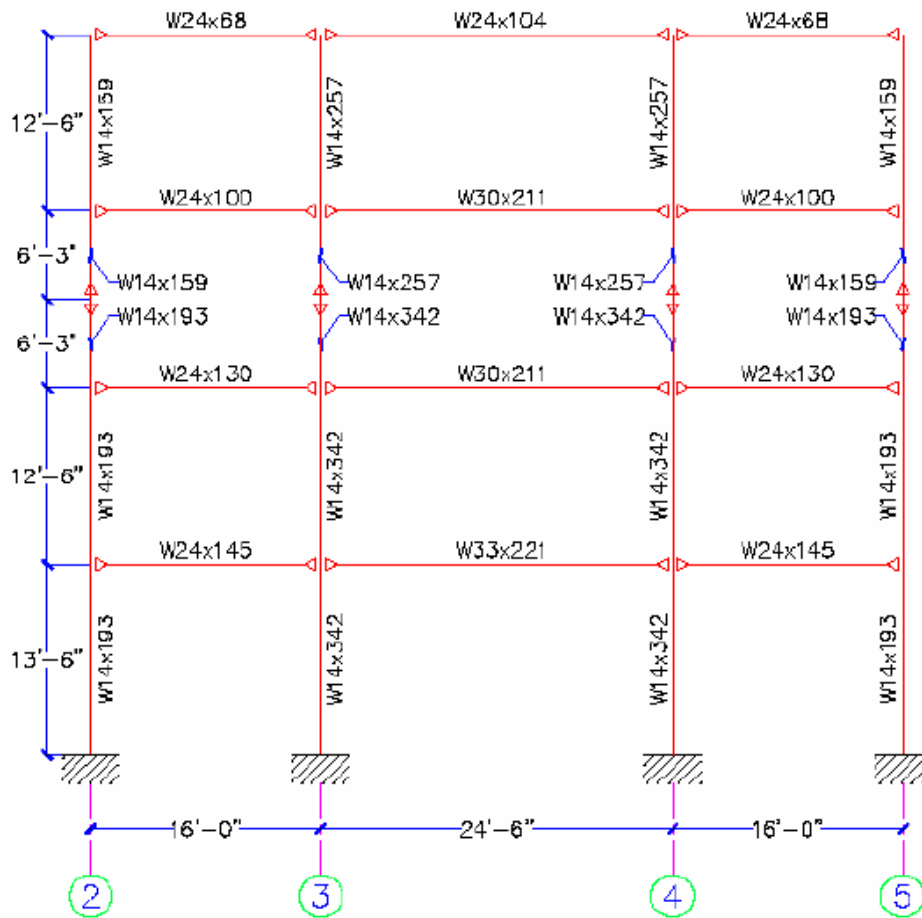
Elevation view of WC70 (N-S frame, Line B)
